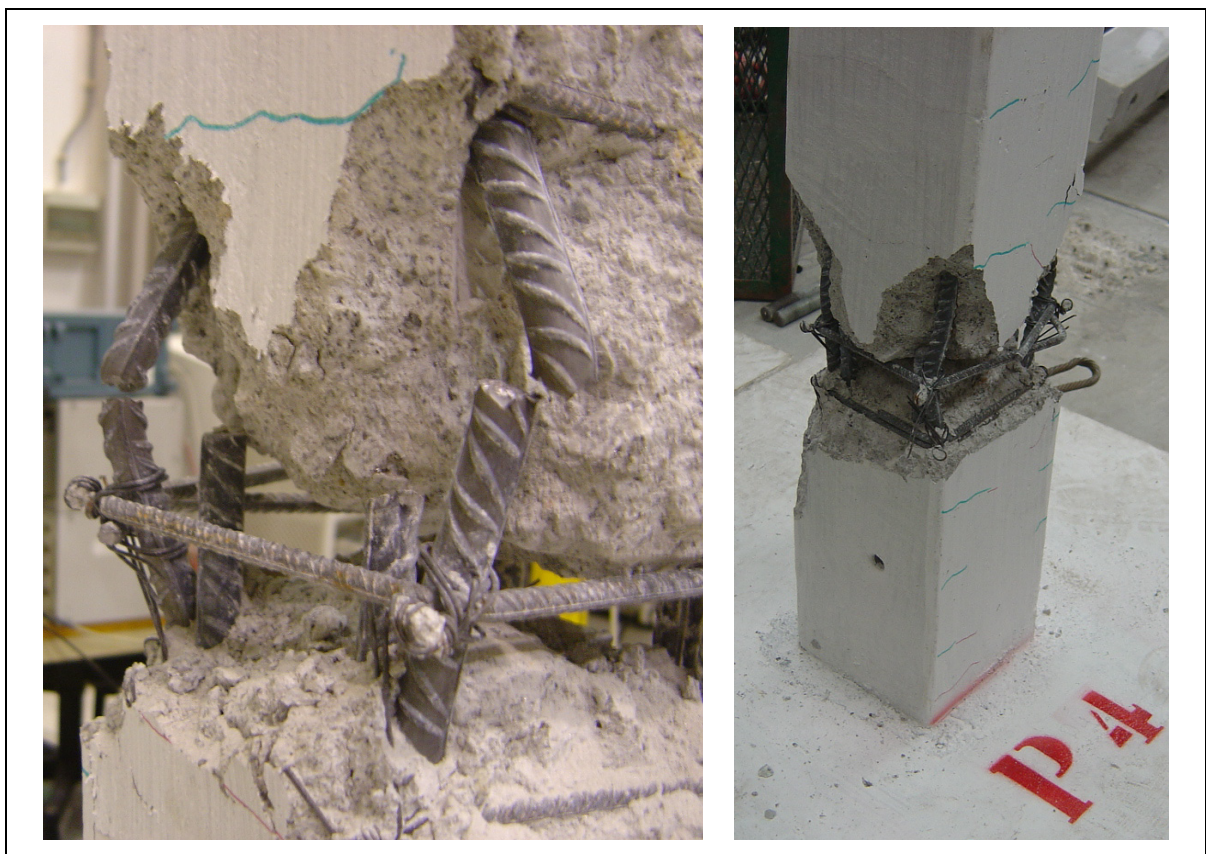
Sp. P4 – Details of the most damaged zone (all the concrete was loose) and of the column-foundation connection.
